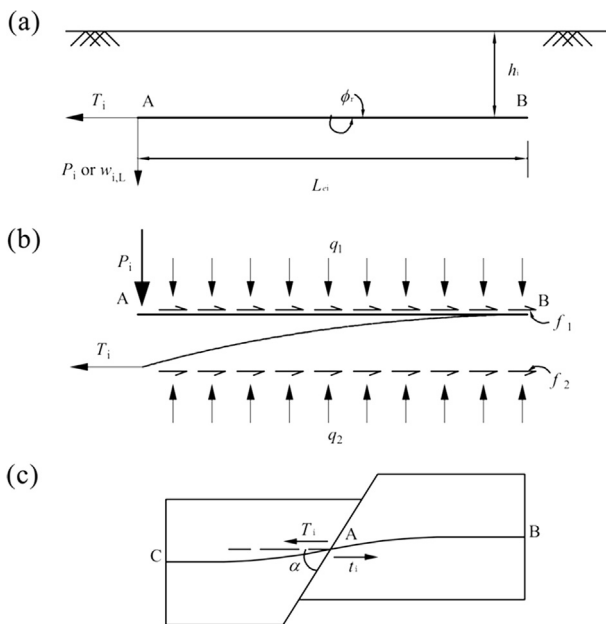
Schematic of model used in Reddy et al. (2008) (a) Single sheet reinforcement subjected to transverse force, (adapted from Madhav and Umashankar, 2003), (b) deformed profile and forces acting on the reinforcement (adapted from Madhav and Umashankar, 2003), (c) Kinematics of failure of horizontal soil slice with reinforcement.
